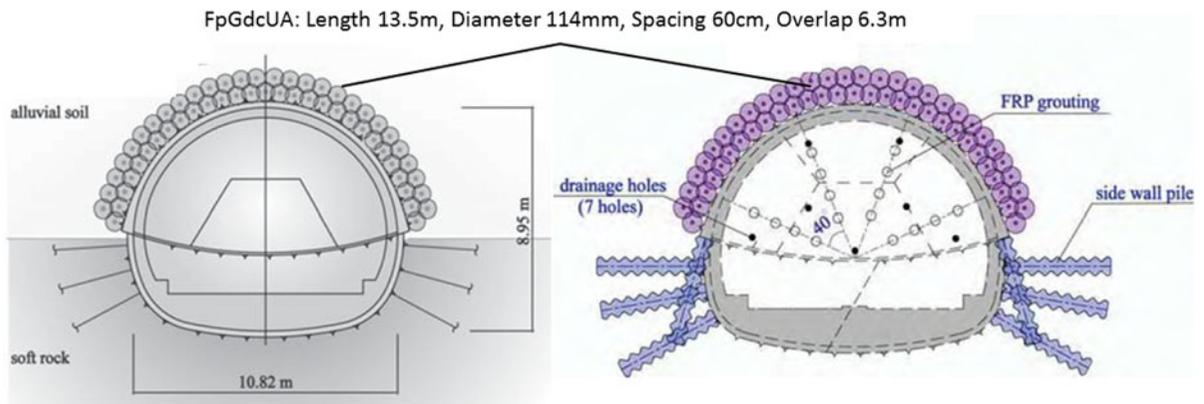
Ground strengthening techniques and dewatering schema of the Seoul Subway Line 9 at construction site 912 (*Left*) excavation method with jet grouting piles (*right*) dewatering scheme (modified after Kim 2008)
